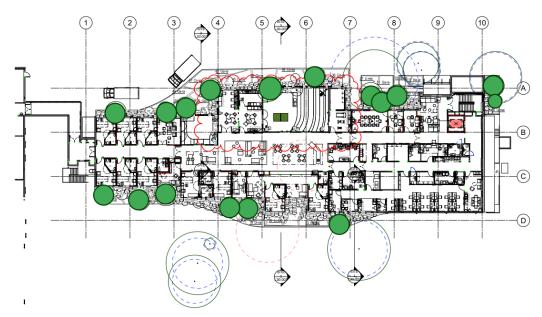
Proposed replacement canopy tree planting (Taylor Brammer)
